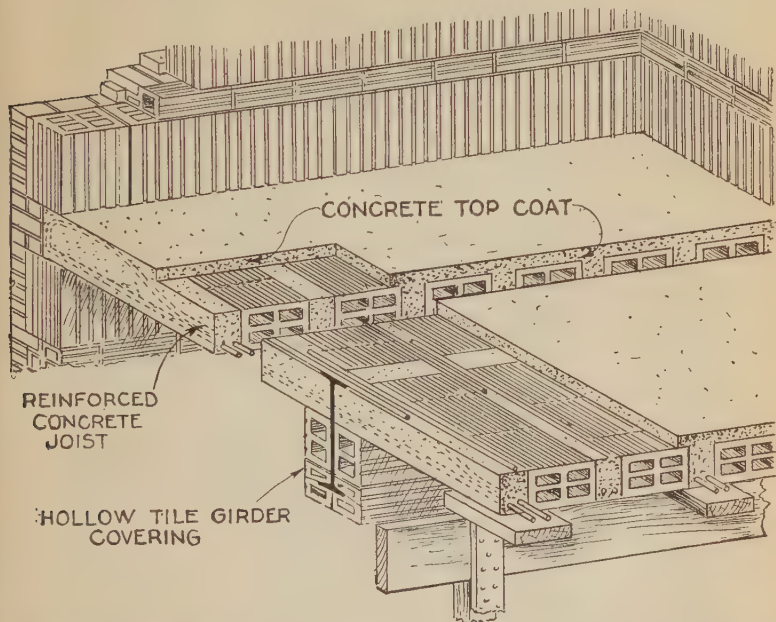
,074.—One way tile joist slab. *In erection*, the tiles are placed about 4 or 5 ins. apart, the concrete in the channels between the rows of tile serving as joists and carrying the reinforcement.
